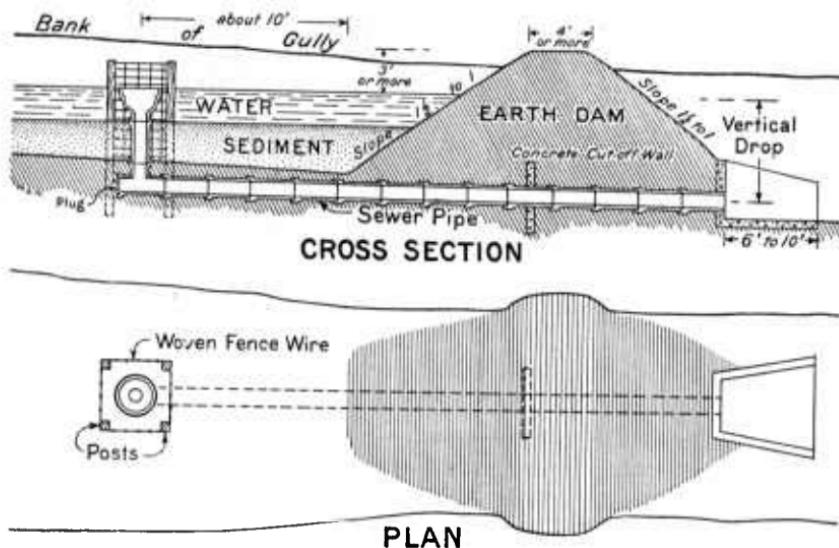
Drop-Inlet and earth soil-saving dam.
